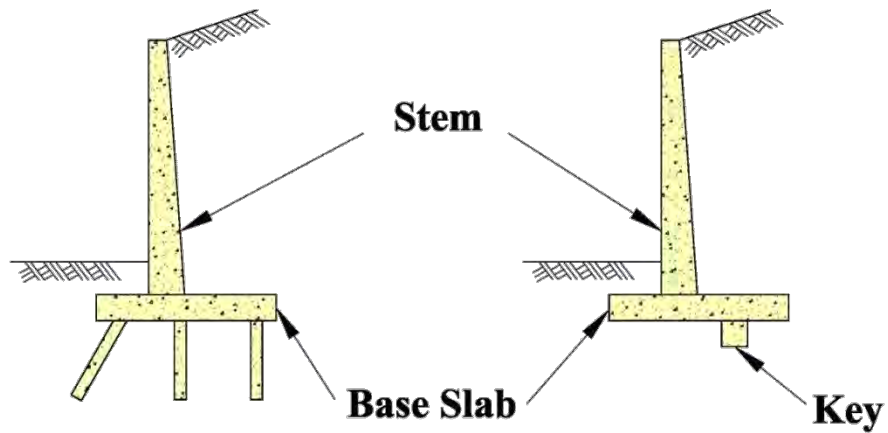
Semi-Gravity Cantilever Retaining Walls
